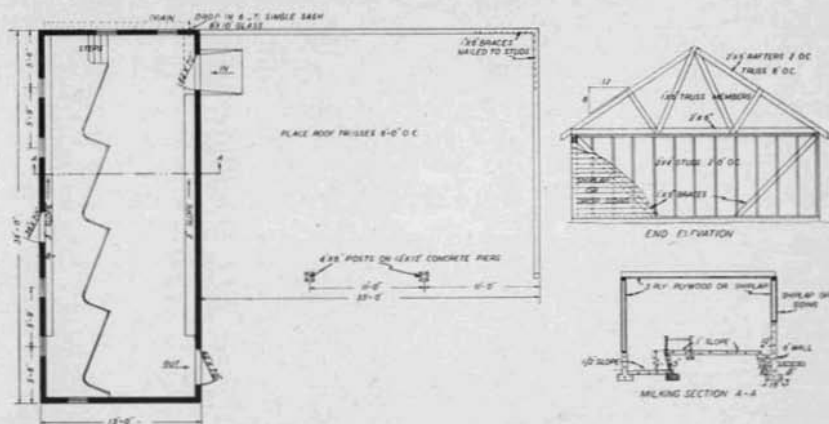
Floor plan of a tandem-type milking barn with four stalls. Although the space required per unit is greater, time and labor is saved during the milking operation with this arrangement. (Plan .721-16C)
